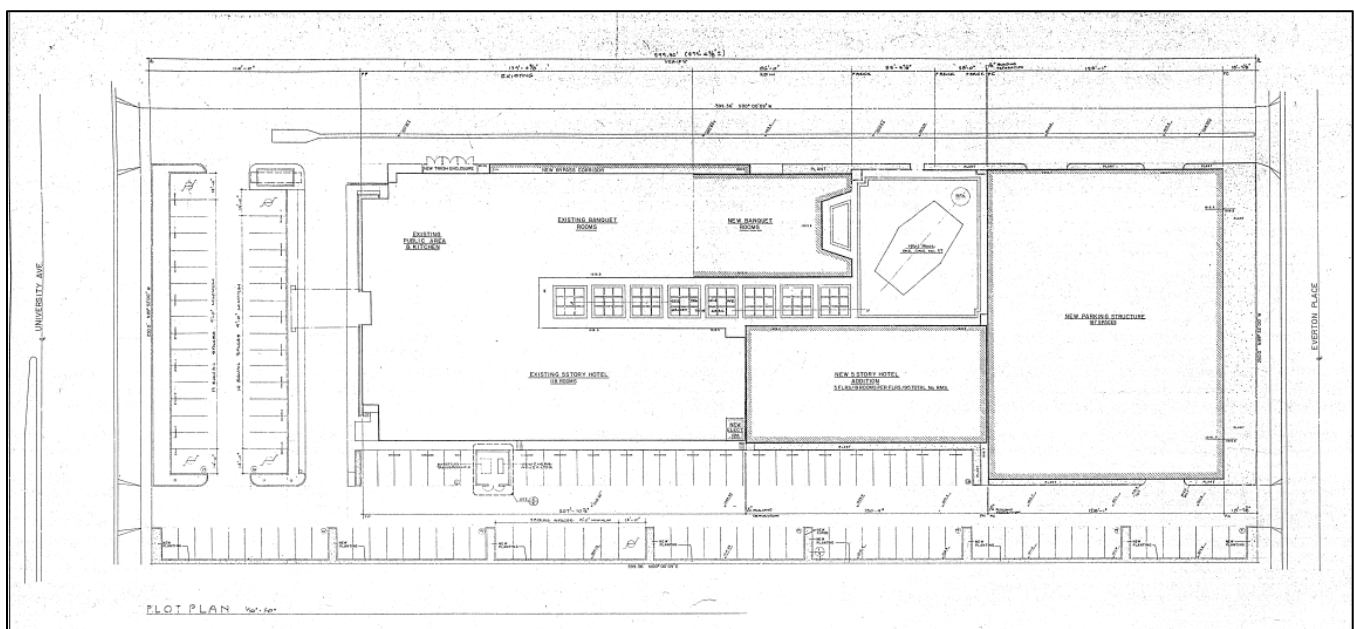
Altered site plan of 1200 University Avenue, 1984 (Rissman & Rissman Associates)
